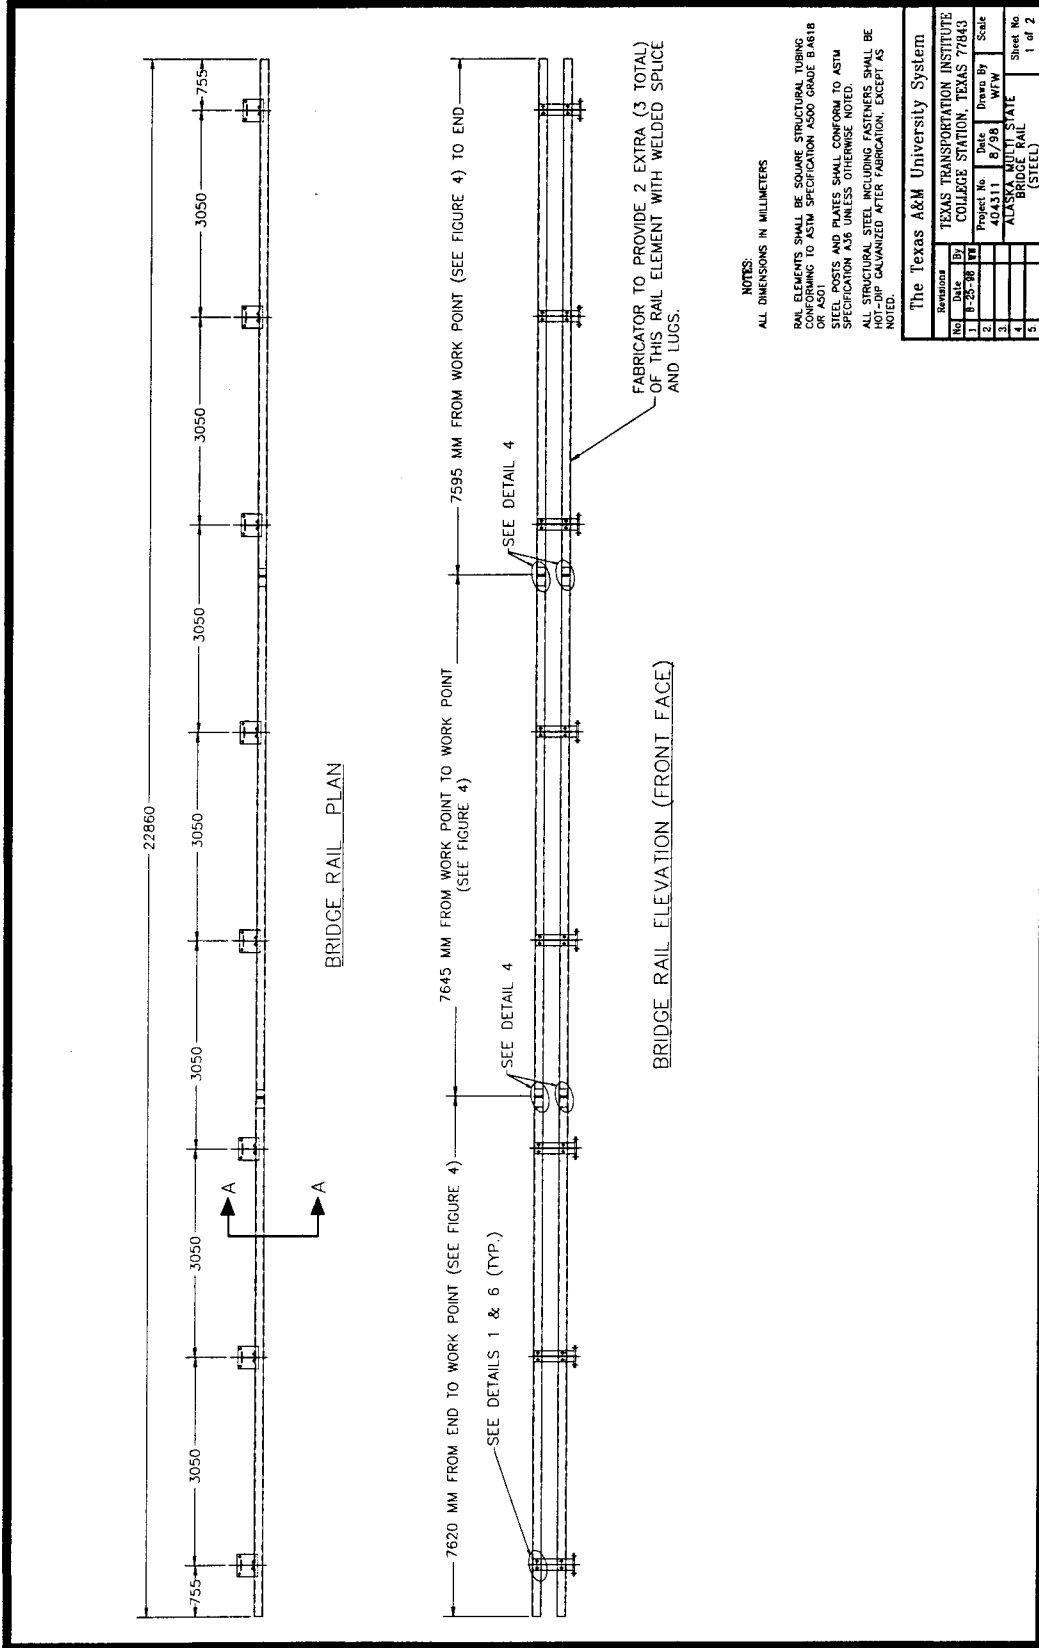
Details of the Alaska Multi-State Bridge Railing mounted on the curb (steel).
